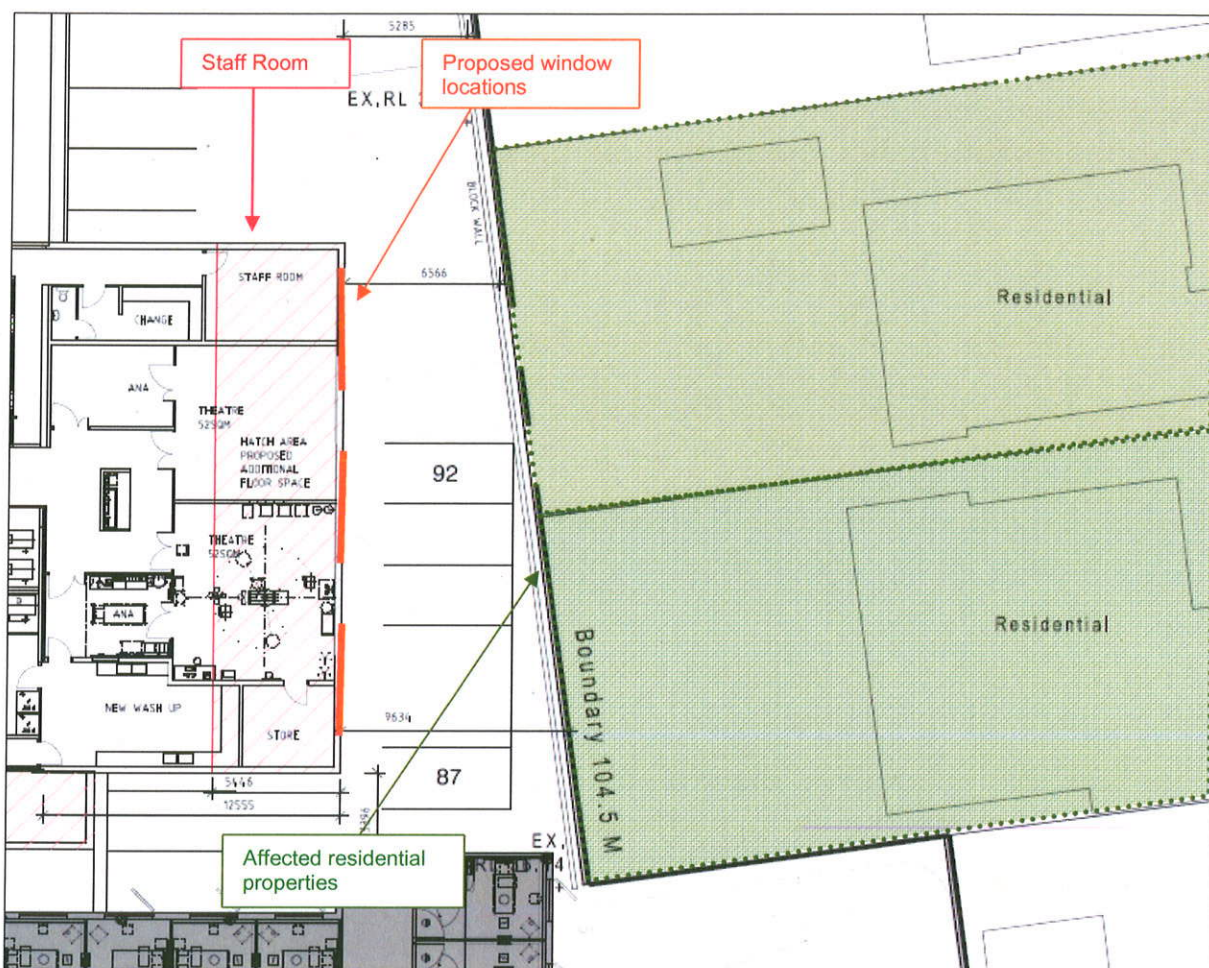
Window locations of proposed eastern extension in relation to adjoining residential properties
